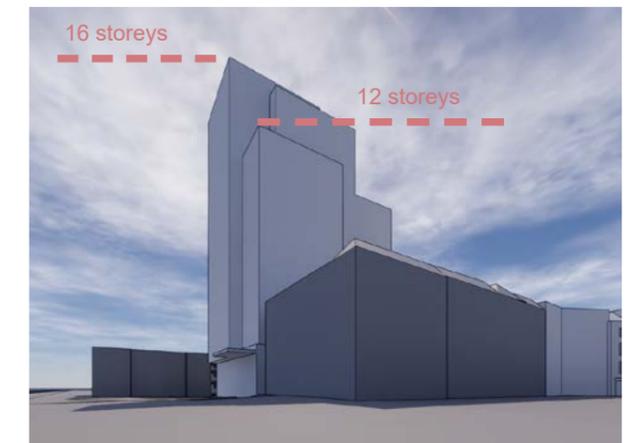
View B from Hunt Museum towards 16 storey building to Bank Place
